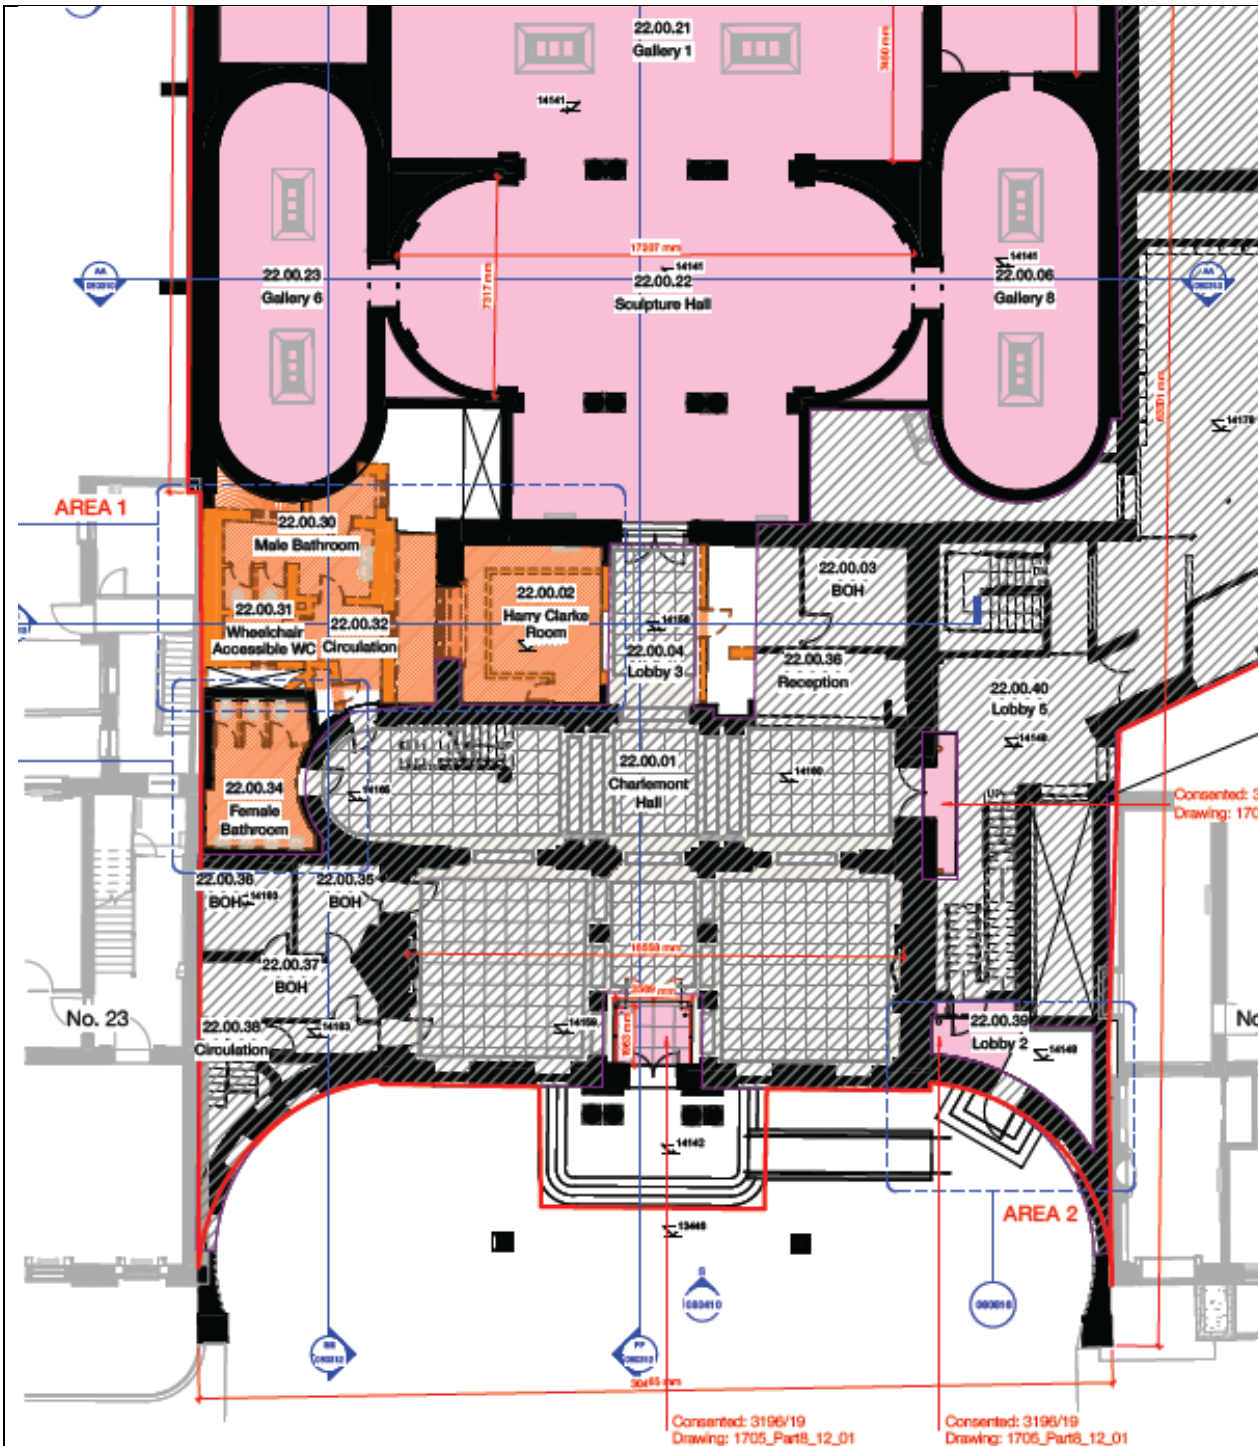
Partial existing ground floor plan with fabric proposed for removal in orange. Not to scale. (Source HB drawing ref: PSL-HBA-HL-00-DR-A-080207 - Rev P04)
